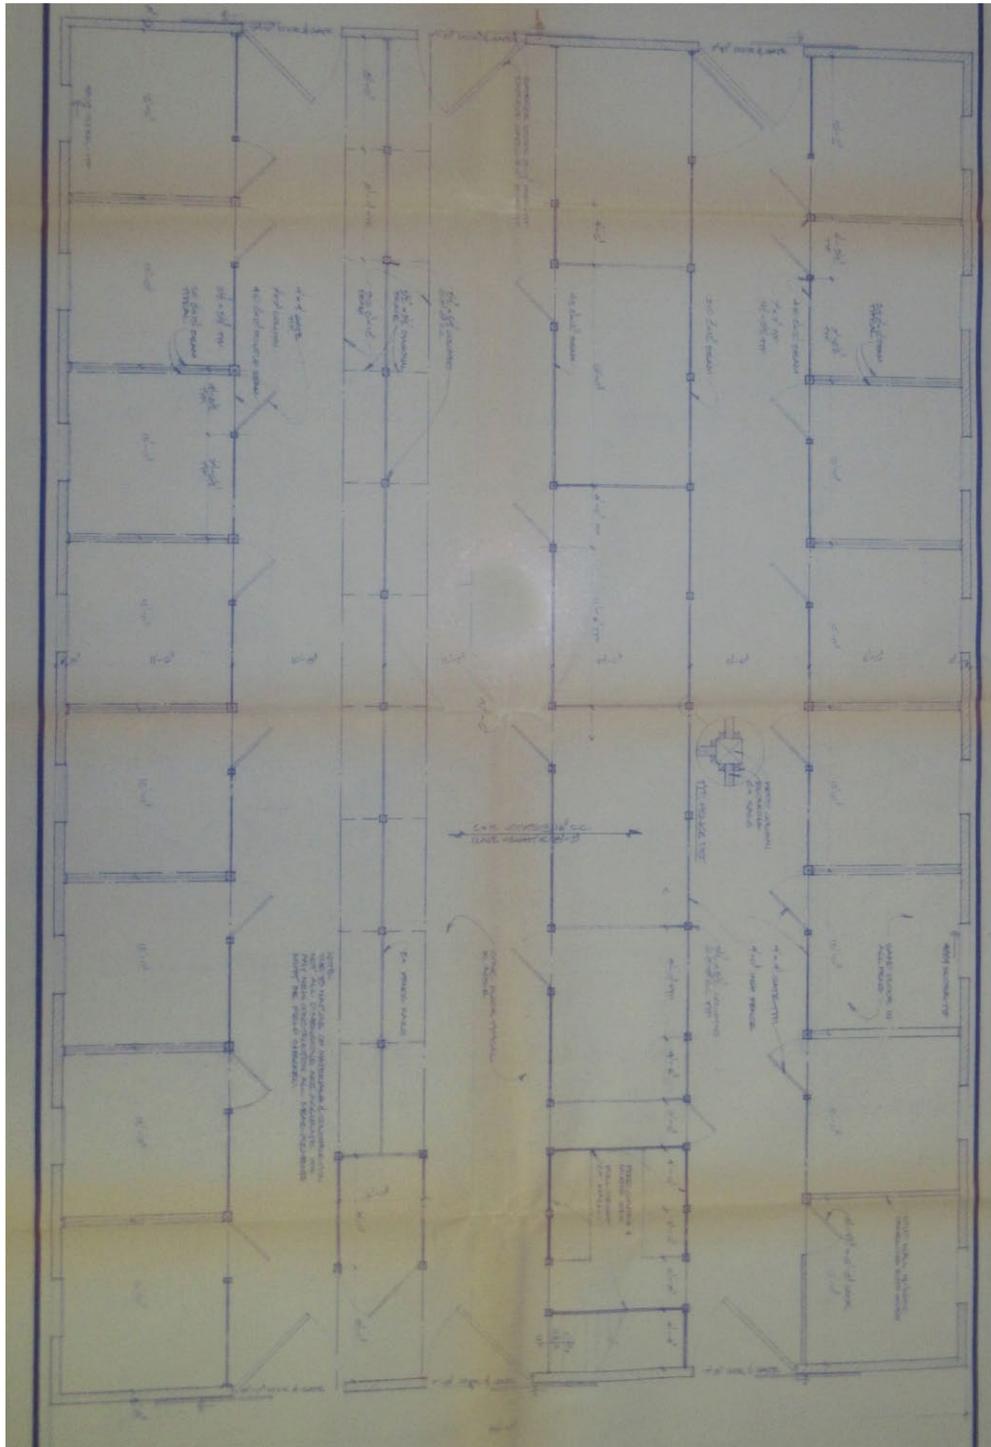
Blueprint of the original floor plan of the first floor, prior to the 1980s remodeling. (Ken-Caryl Ranch archives)
